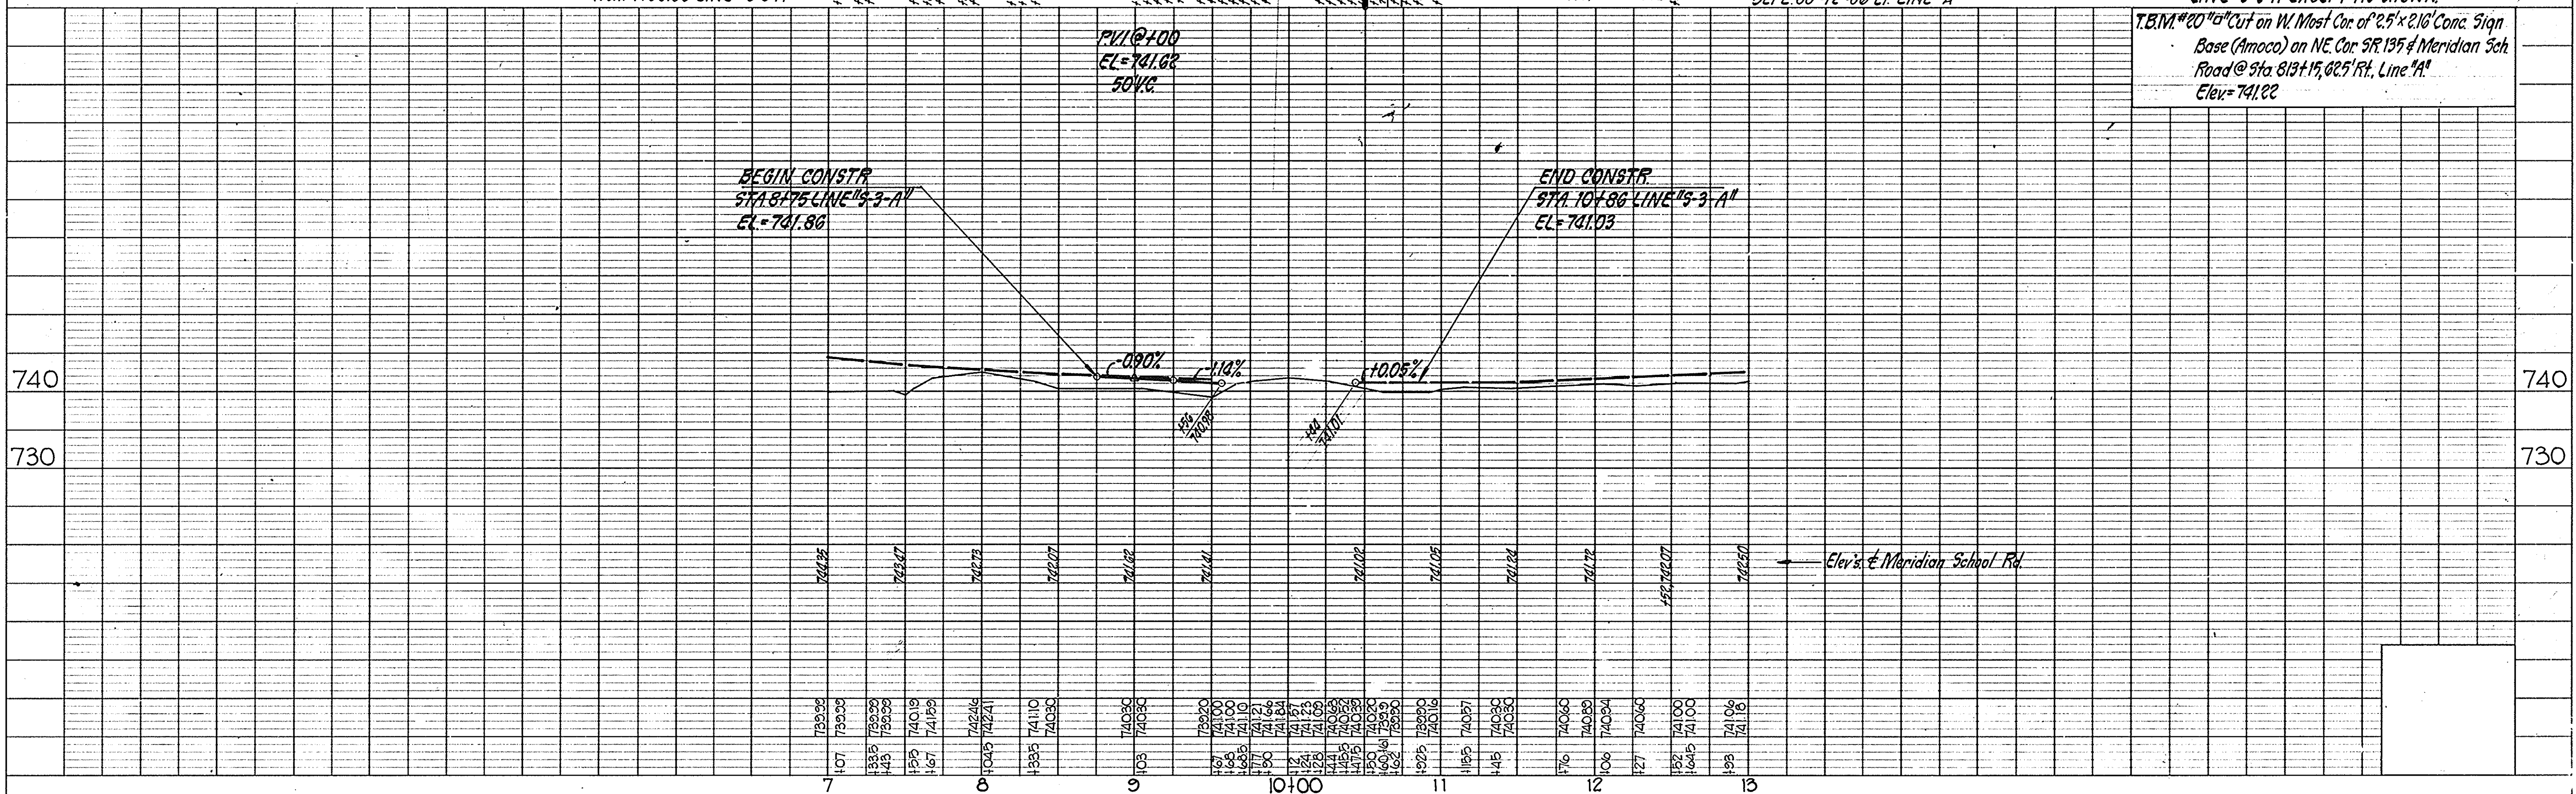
PLAN - PROFILE B. R. STANDARD
